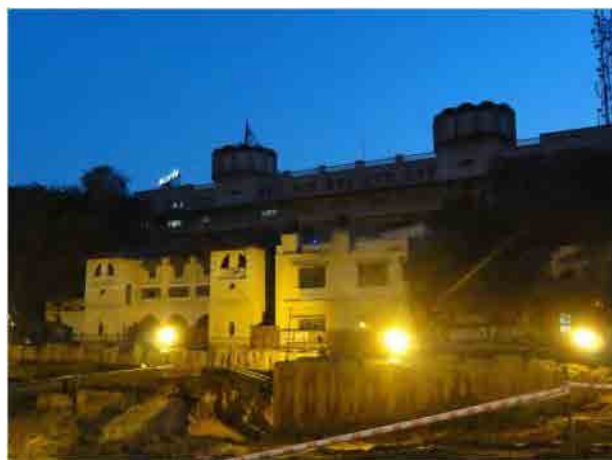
shows the location and inclination sensor installed on the roof top of BSNL building. This brick building is older than 100 years and has very small tolerance in terms of inclination. The LEC used here is a stand-alone type and data retrieval was done manually using an SD card mounted on the LEC.
